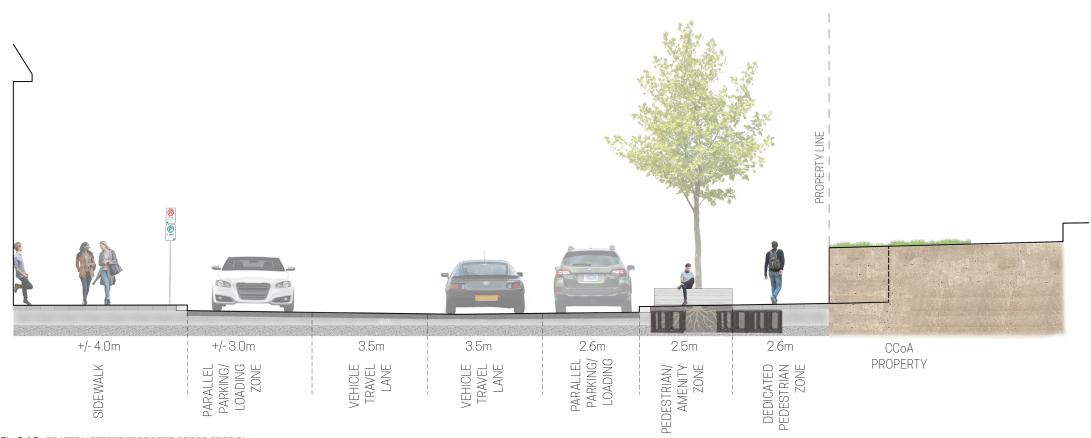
GRAFTON STREET PROPOSED CROSS SECTION
